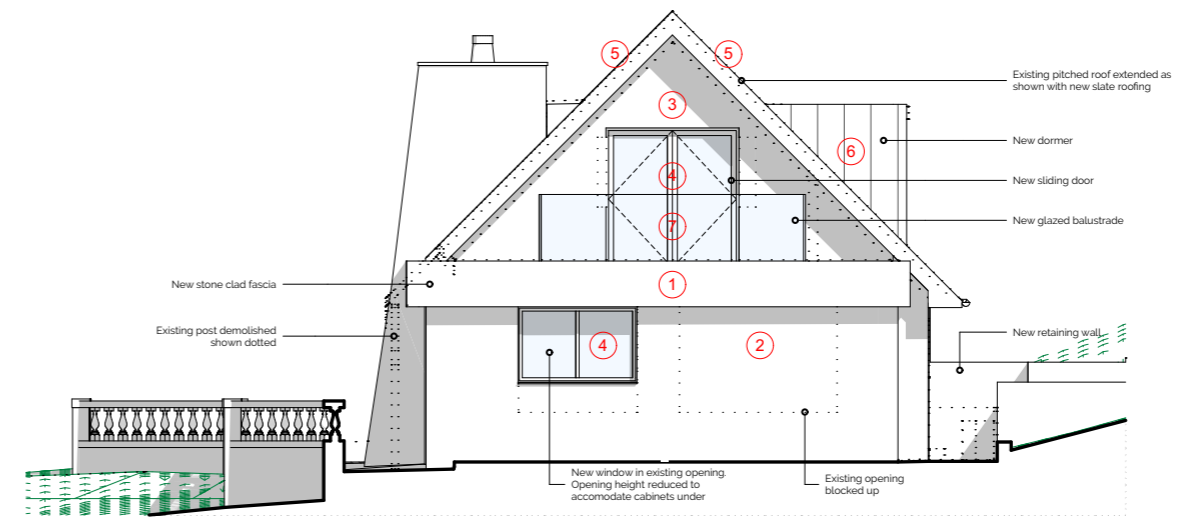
71 Leeson Road Proposed East Elevation - Not to Scale
